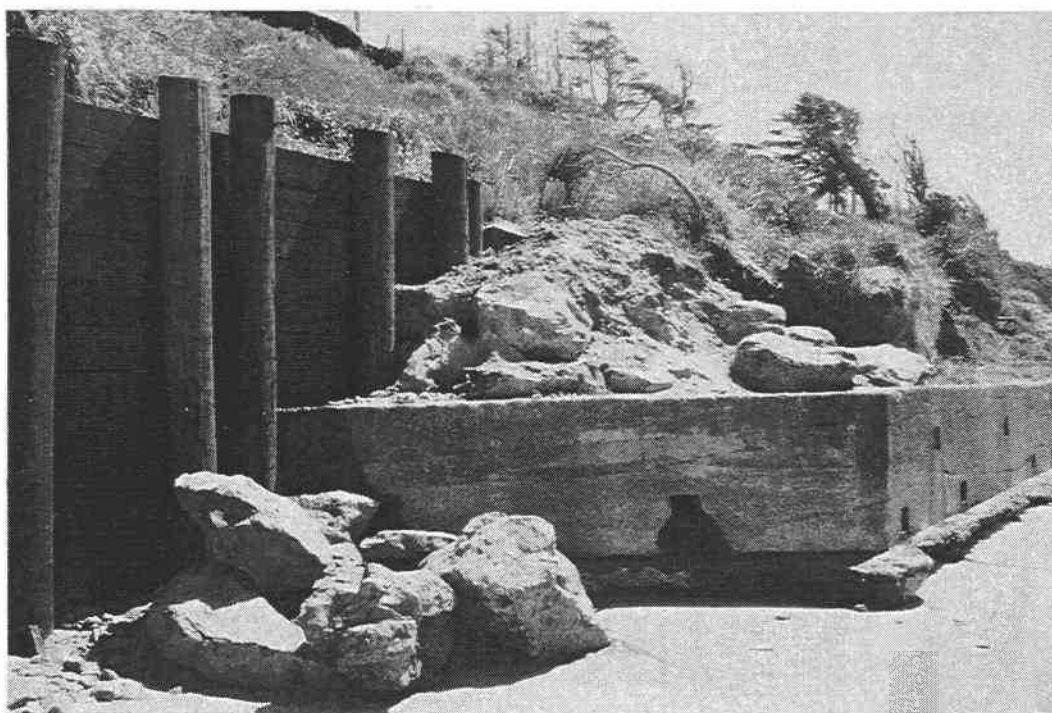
Old concrete-reinforced seawall adjacent to new timber-pile retaining wall at Arch Cape on the northern Oregon coast.
